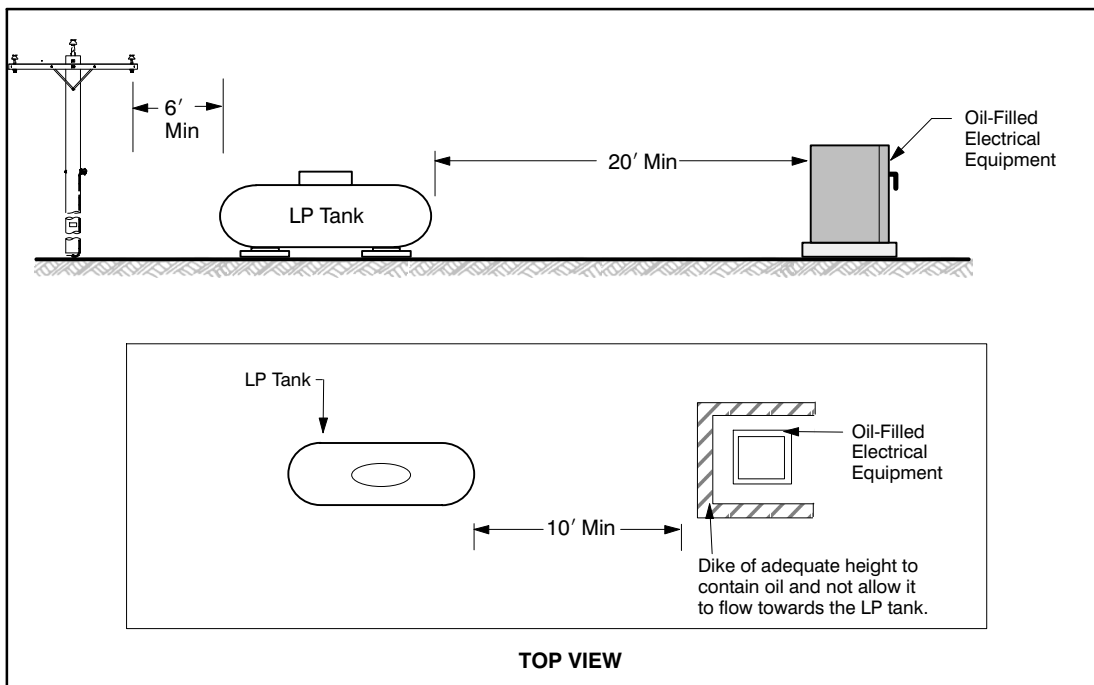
Minimum clearances from oil-filled equipment to LP, hazardous liquid, or fuel tanks
